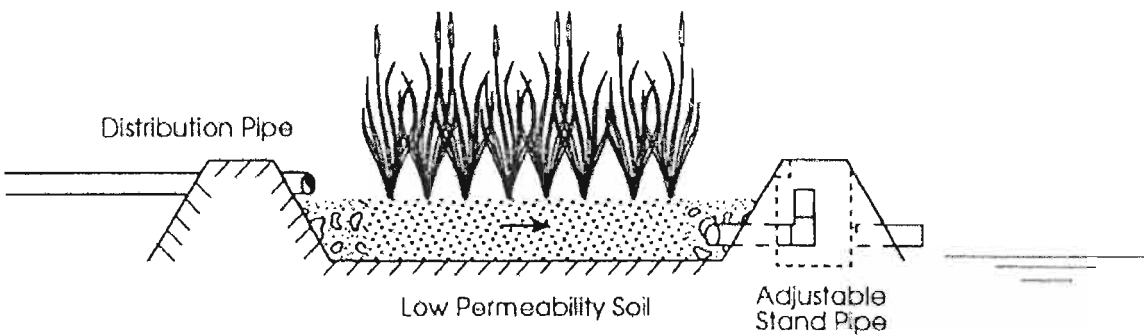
Typical cross sectional layout of a VSB constructed wetland (Kadlec and Knight (1996).
